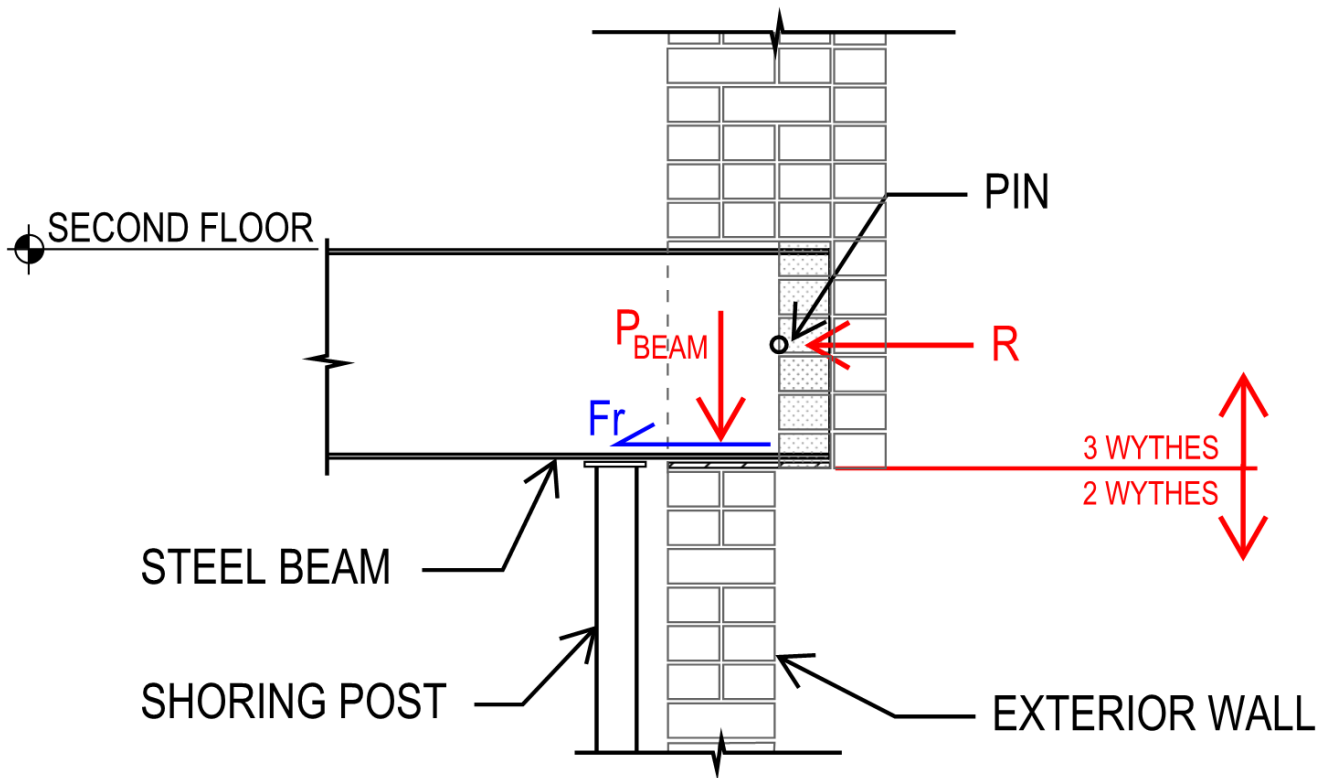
Reaction at beam connection to Pier D at the second floor.
